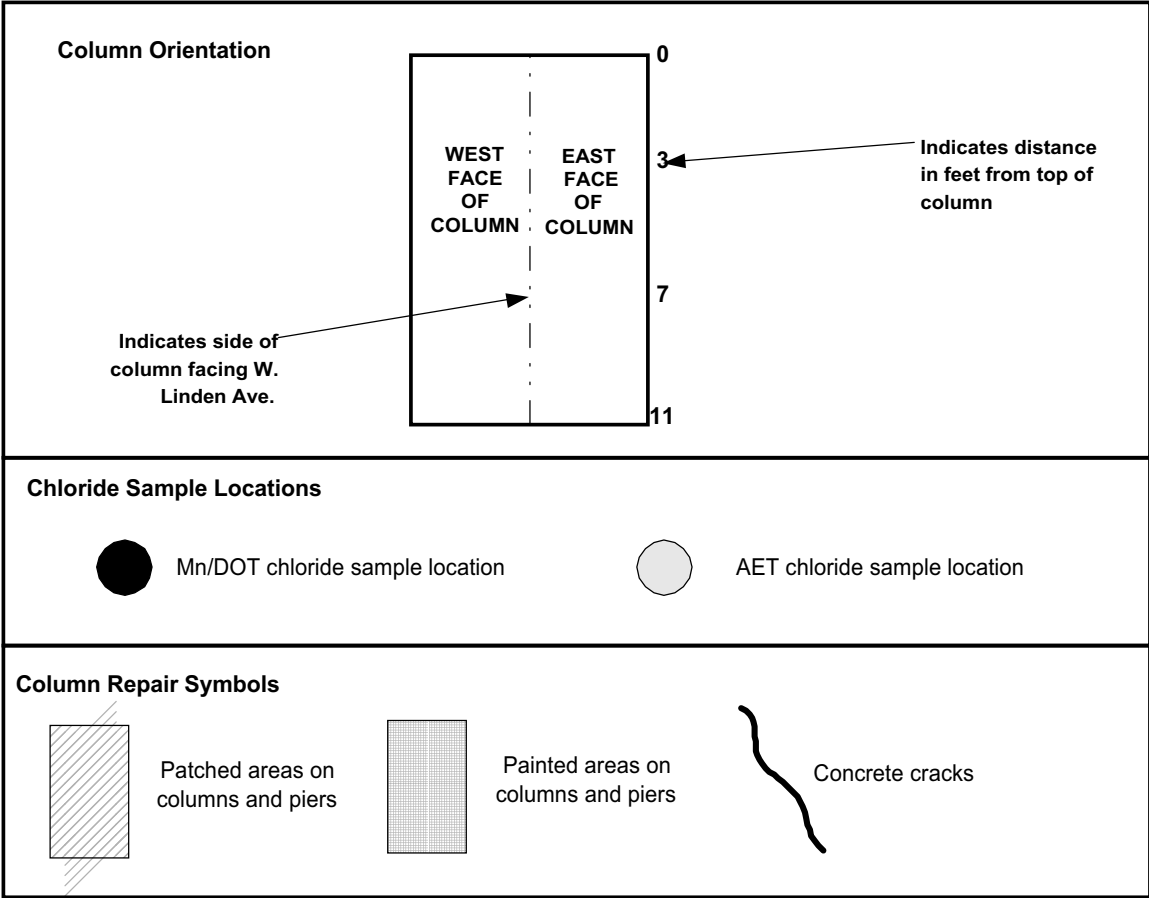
Legend for concrete repair and chloride sample location illustrations
